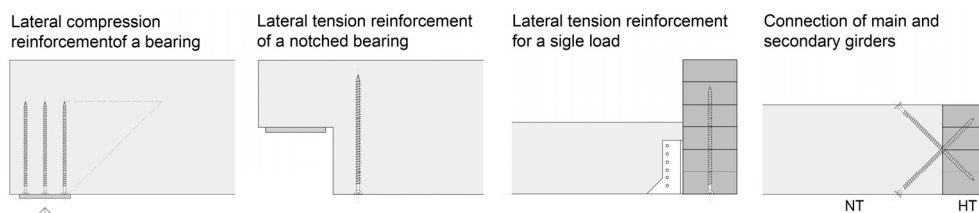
Examples for possible applications of continuously-threaded screws as reinforcements and connecting members
